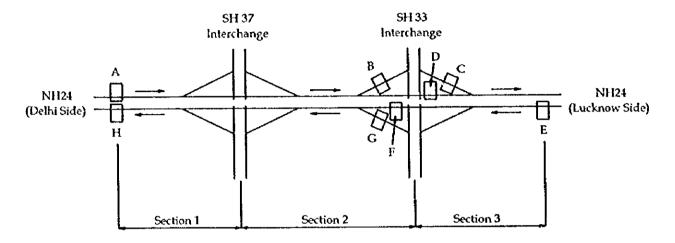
Toll Collection System proposed for Bareilly Bypass
